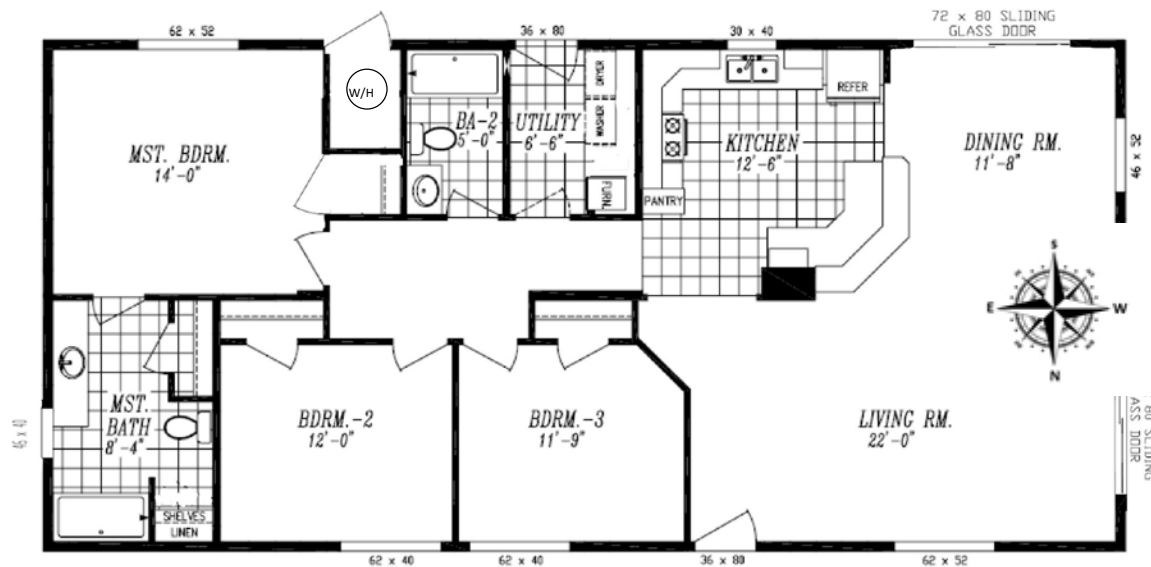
Floor Plan of the Lab Homes as Constructed
